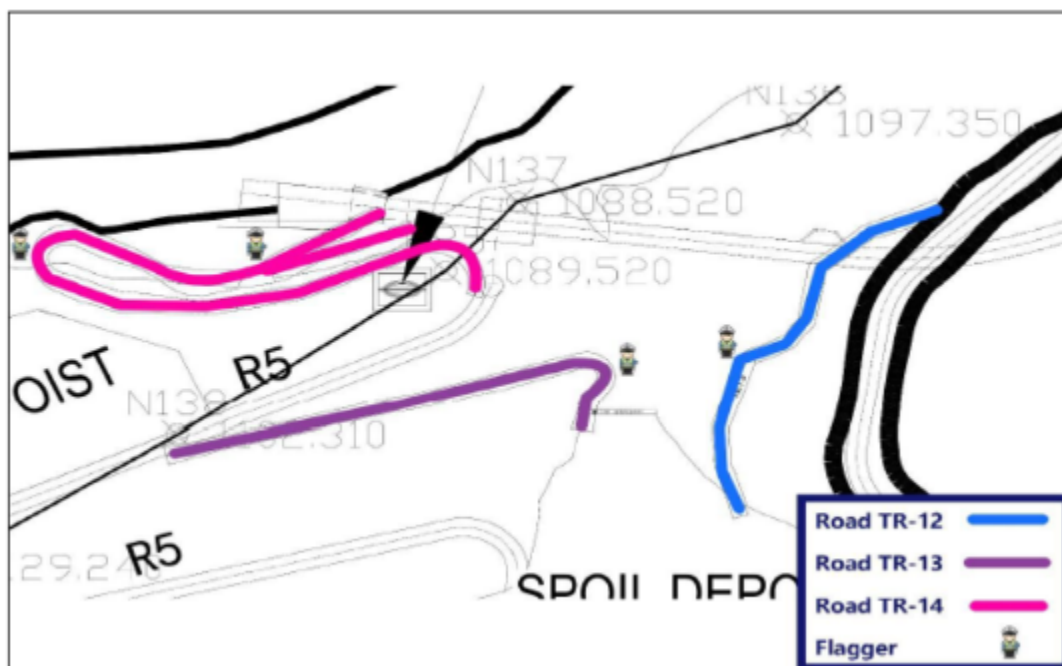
Layout of Temporary Access Roads to Adit-1Figure 4-11: Layout of Temporary Access Roads to Adit-2
